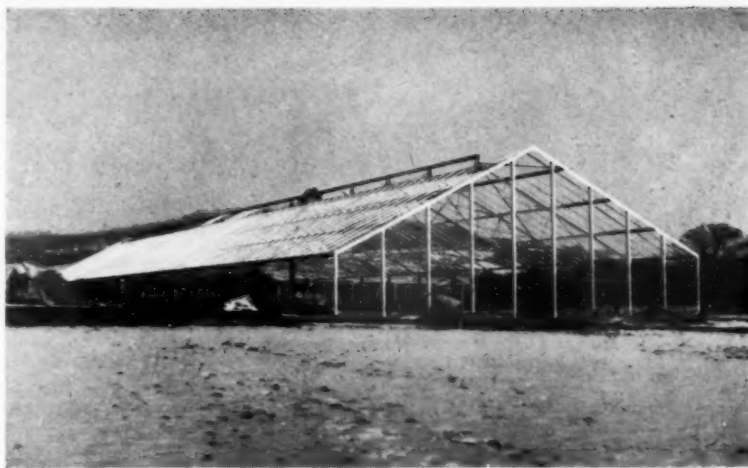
Aluminium alloy greenhouse — typical of the large number of commercial glasshouses now in use and under construction.
